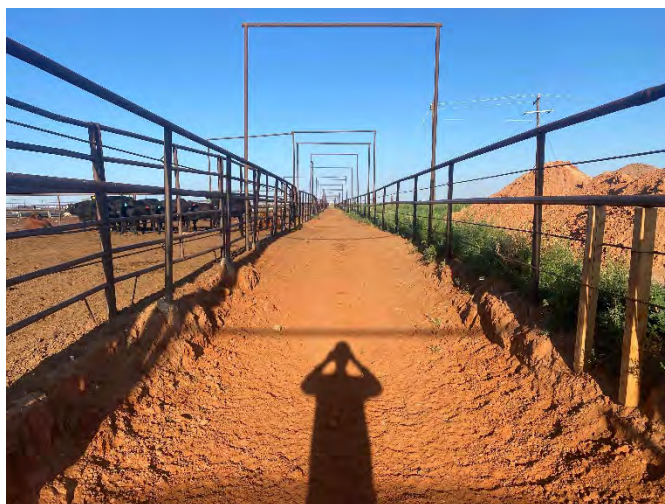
Photo view of release area after further excavation of impacted soils (30Aug23)
